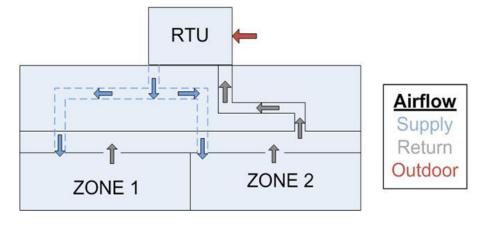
AIRFLOW OF A TYPICAL ROOFTOP UNIT
